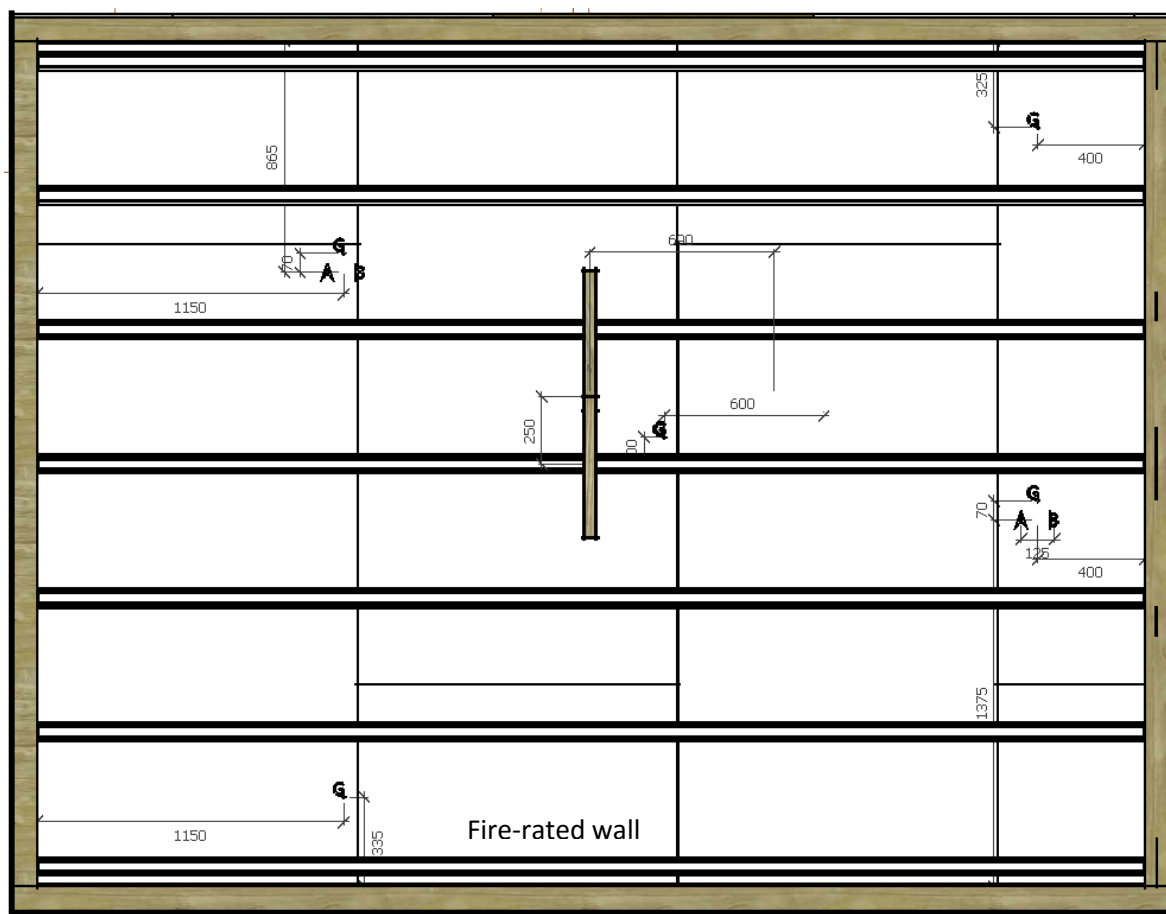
Experiment #2 Ceiling thermocouple locations, viewed from above (ceiling void side)
